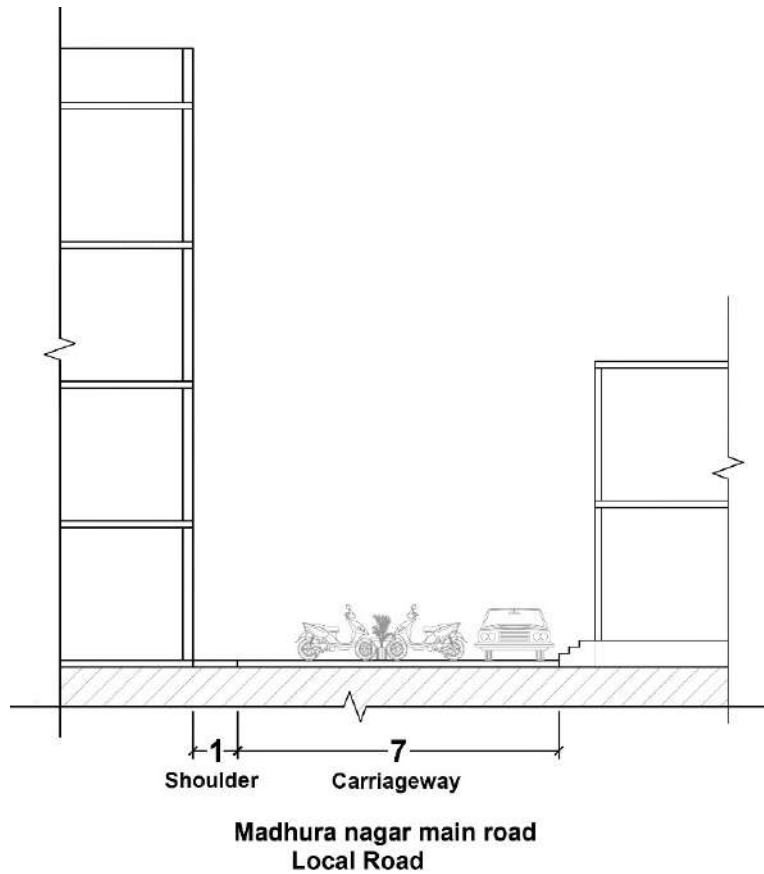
Cross section of Madhura Nagar Main Road (F – F')
